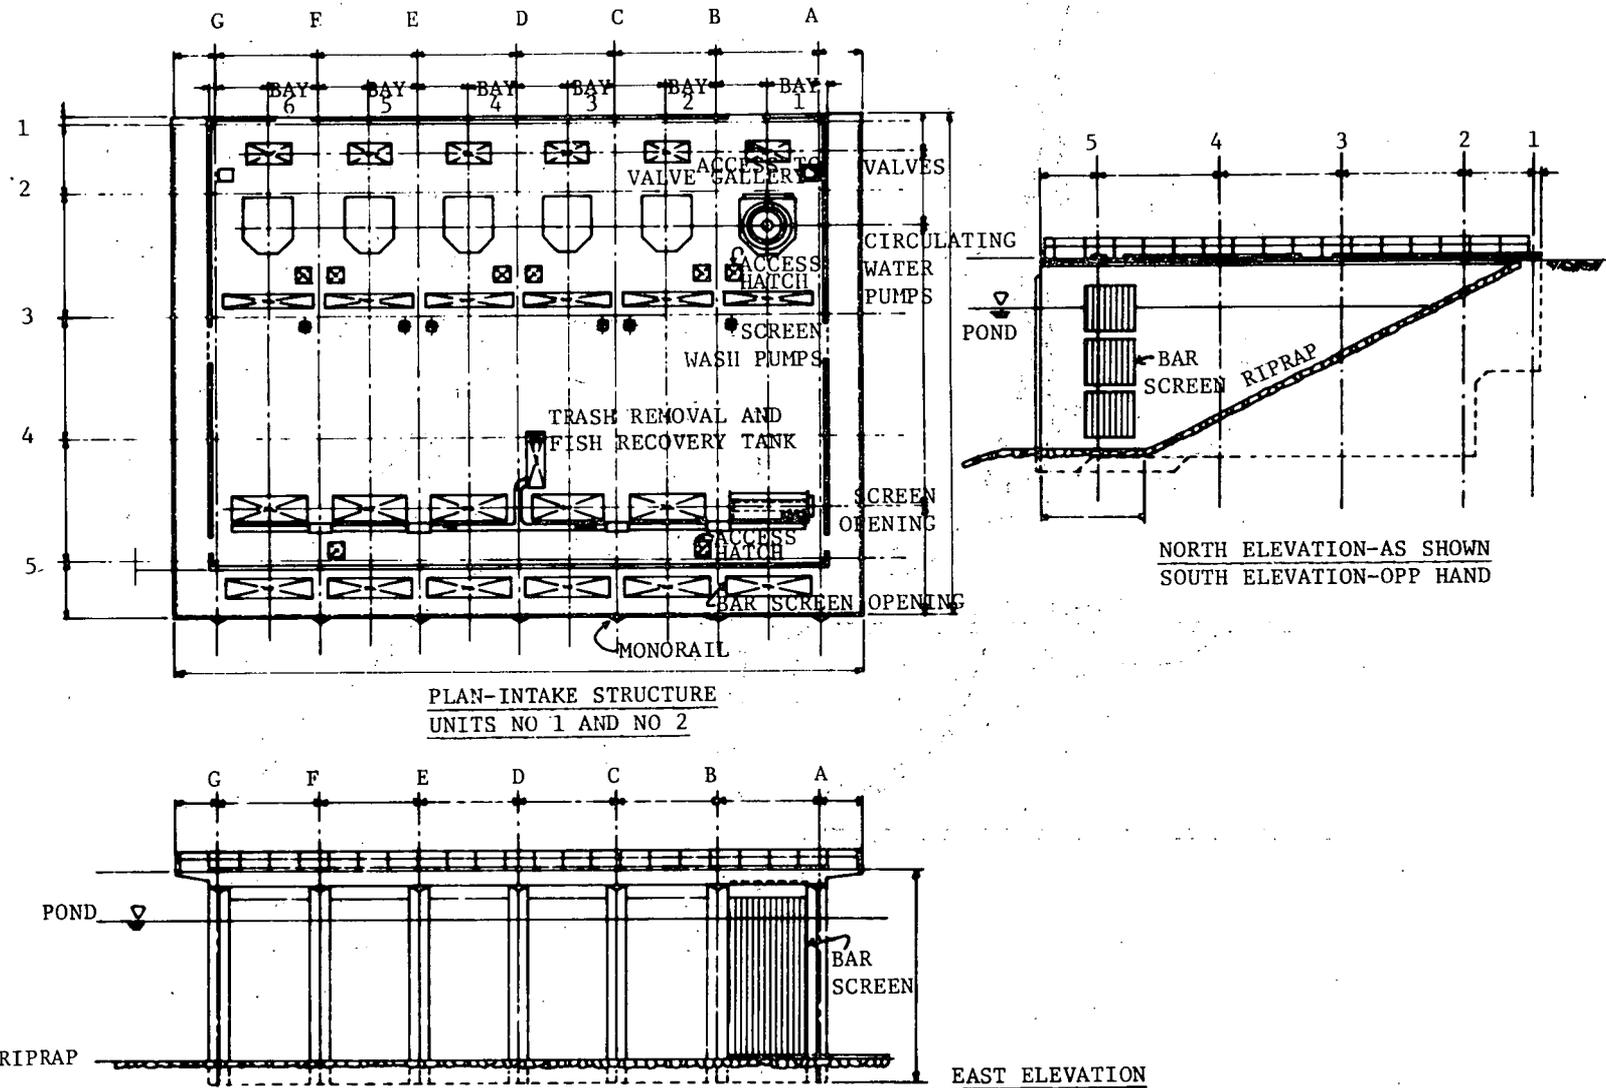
Plan and Elevations of Intake Structures of Bowline Point Generating Station Units 1 and 2
